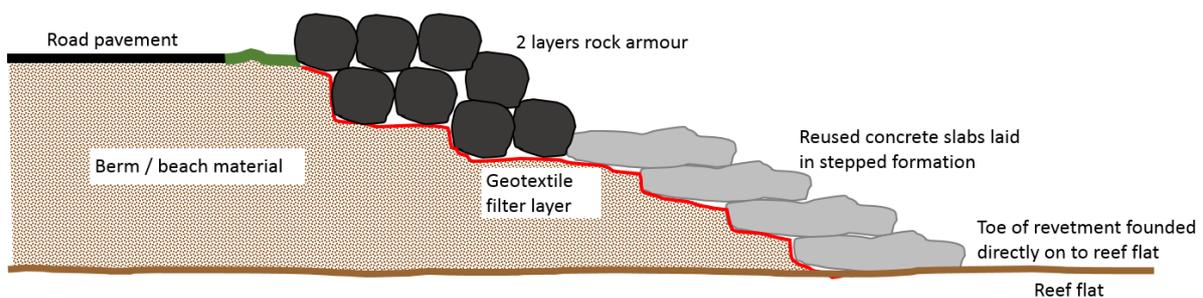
Cross-section of the proposed reconstructed revetment at Paal. Source: Project Proposal Document
